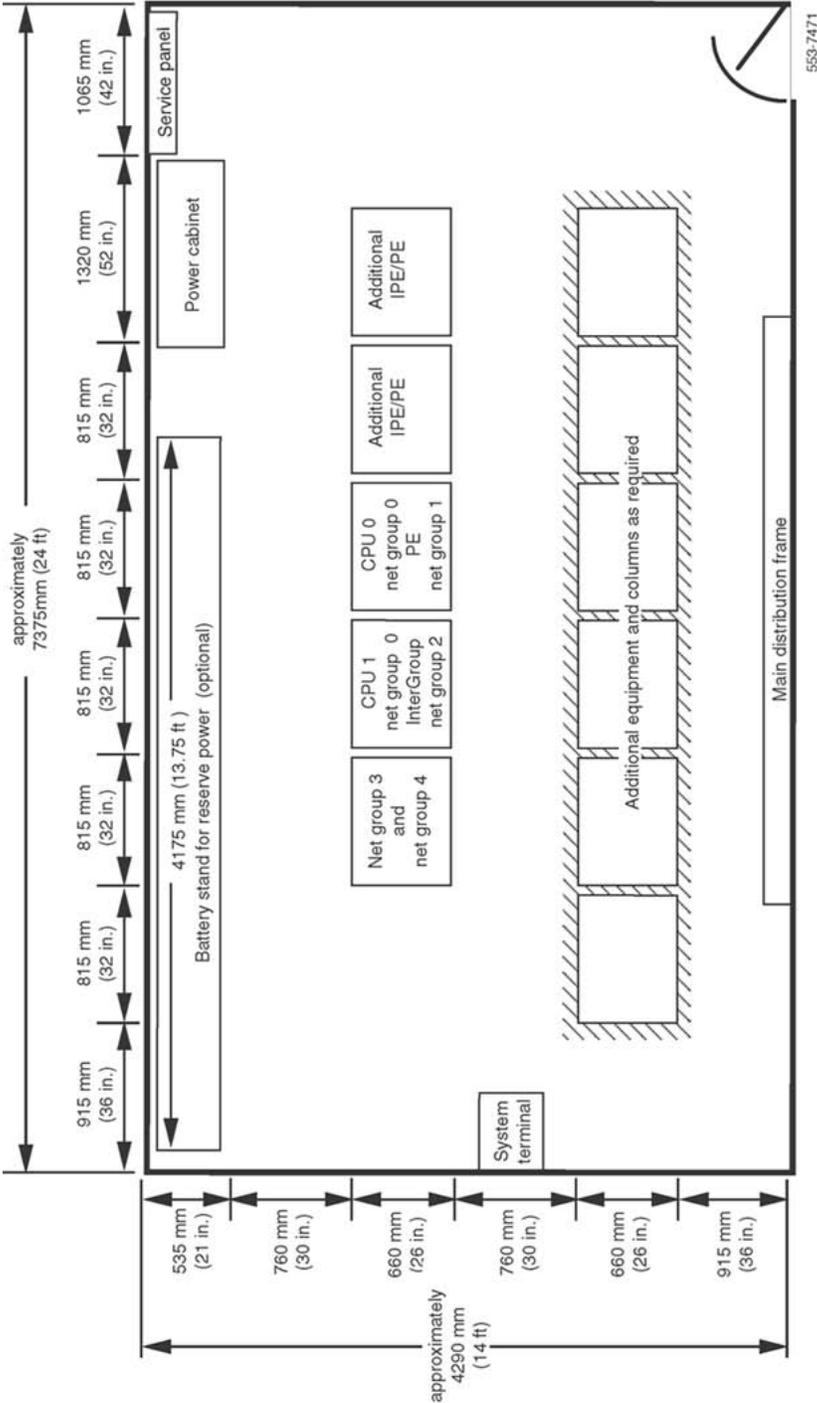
Meridian 1 Option 81C CP PIV equipment room floor plan
